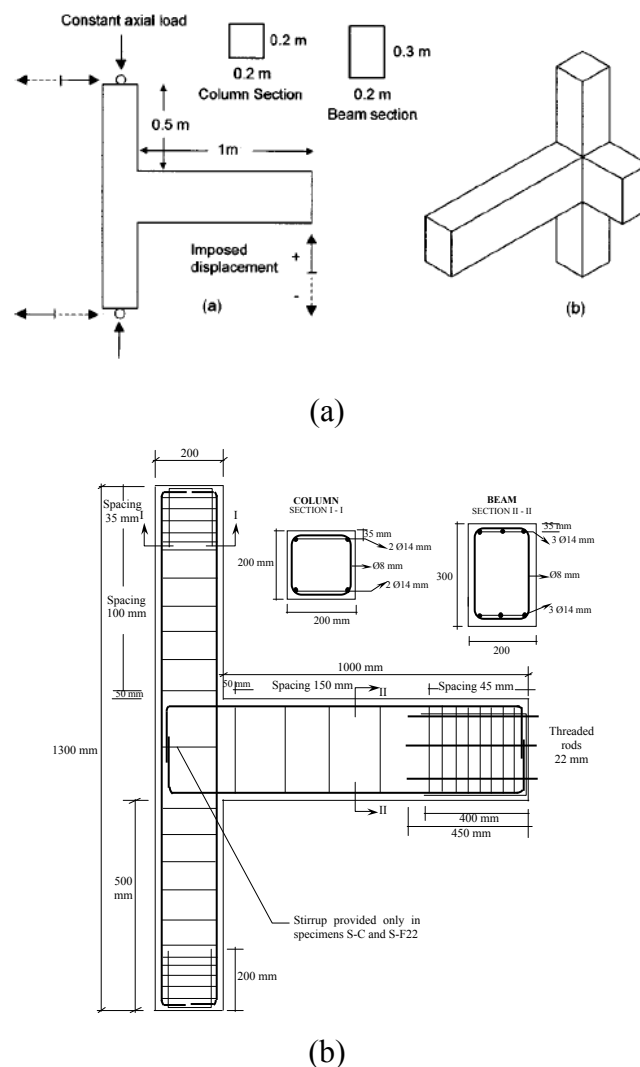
Specimen tested by Antonopoulos and Triantafillou (2003) : (a) Geometry of specimen with the presence of a transverse beam on joints T-C, T-F33 and T-F22S2; (b) Details of reinforcement
